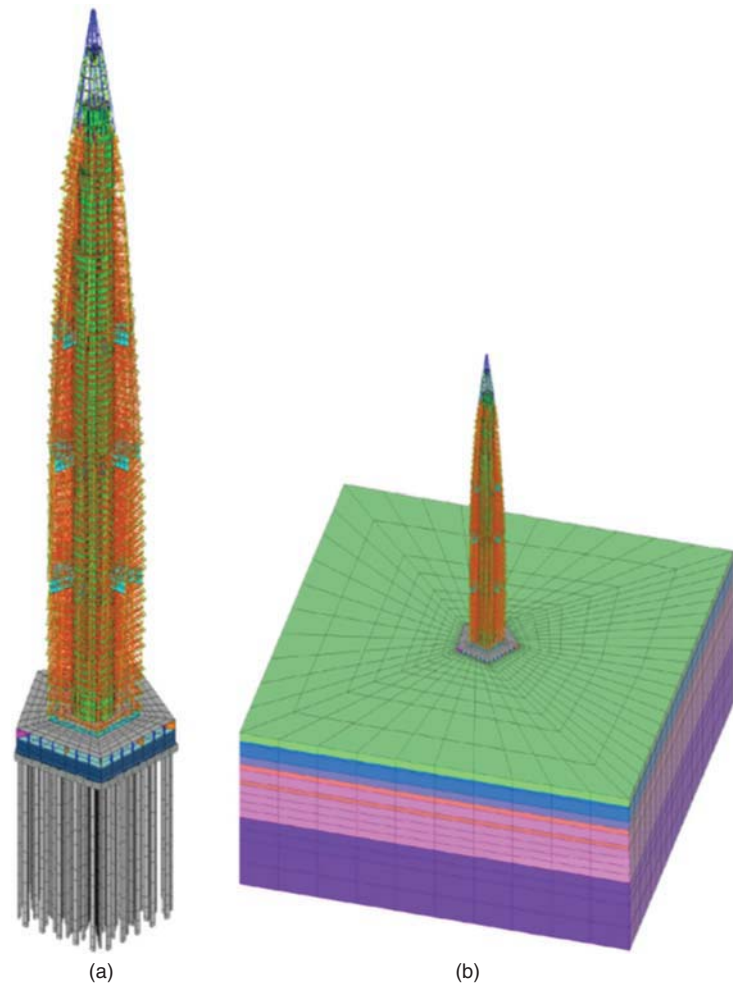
Complete soil-foundation-structure simulation: (a) Tower and foundation. (b) Tower, foundation, and mass. (Courtesy of Lisyuk and Ulitsky 2012)
